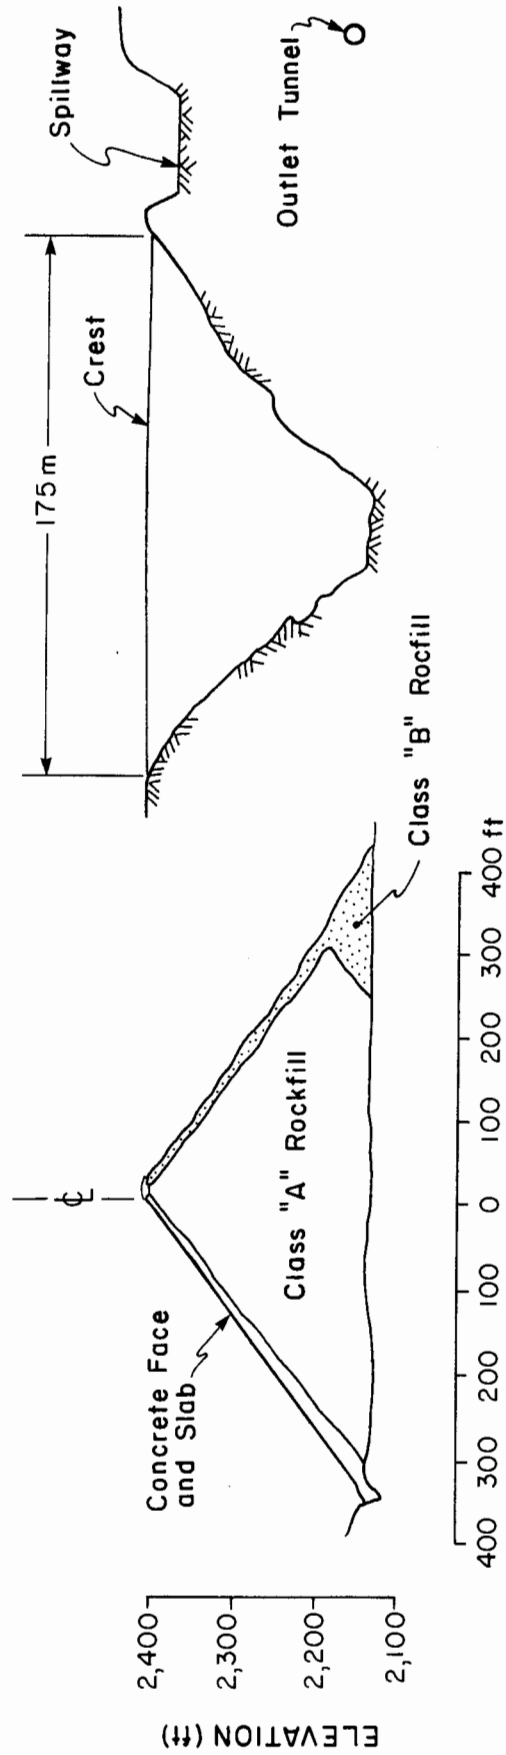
TRANSVERSE AND LONGITUDINAL CROSS-SECTIONS; COGSWELL DAM
